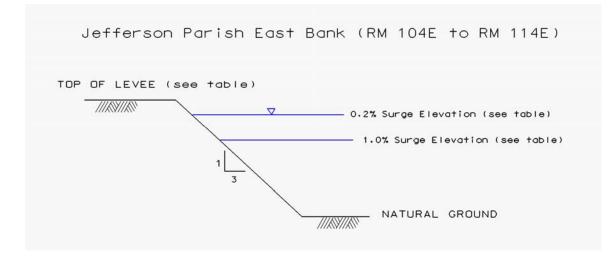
Typical Levee Design Cross-section (RM 104E-RM 114E) – Jefferson Parish East Bank
